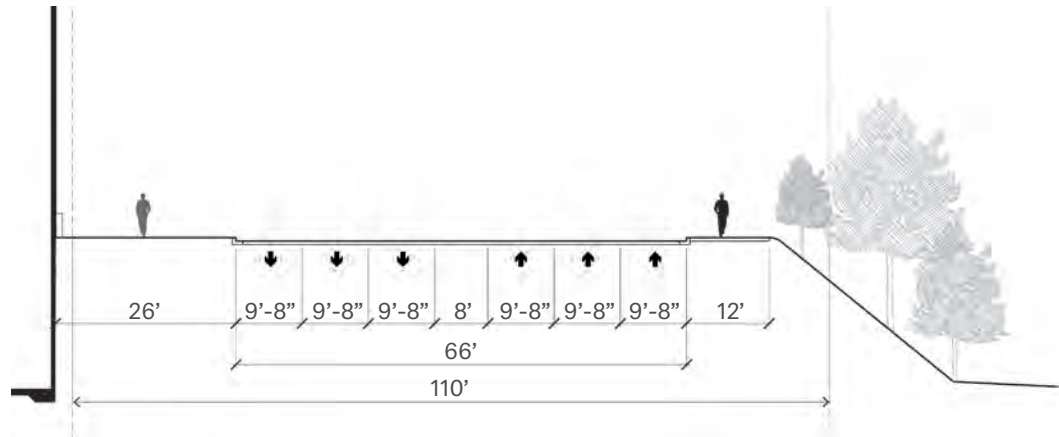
Section B-B': Existing conditions of South Congress Avenue
